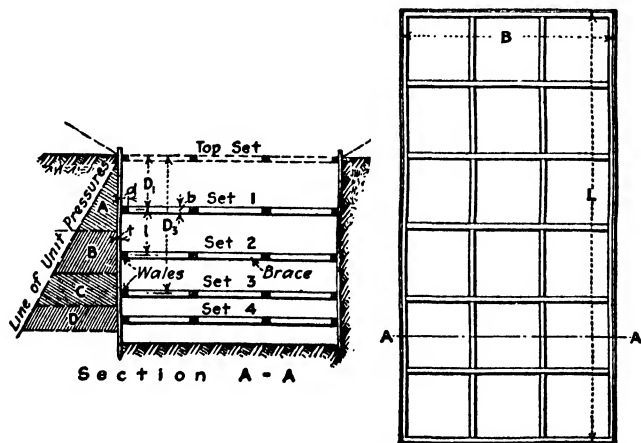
Plan, Section, and Outside Pressure Diagram of Single-wall Cofferdam.
